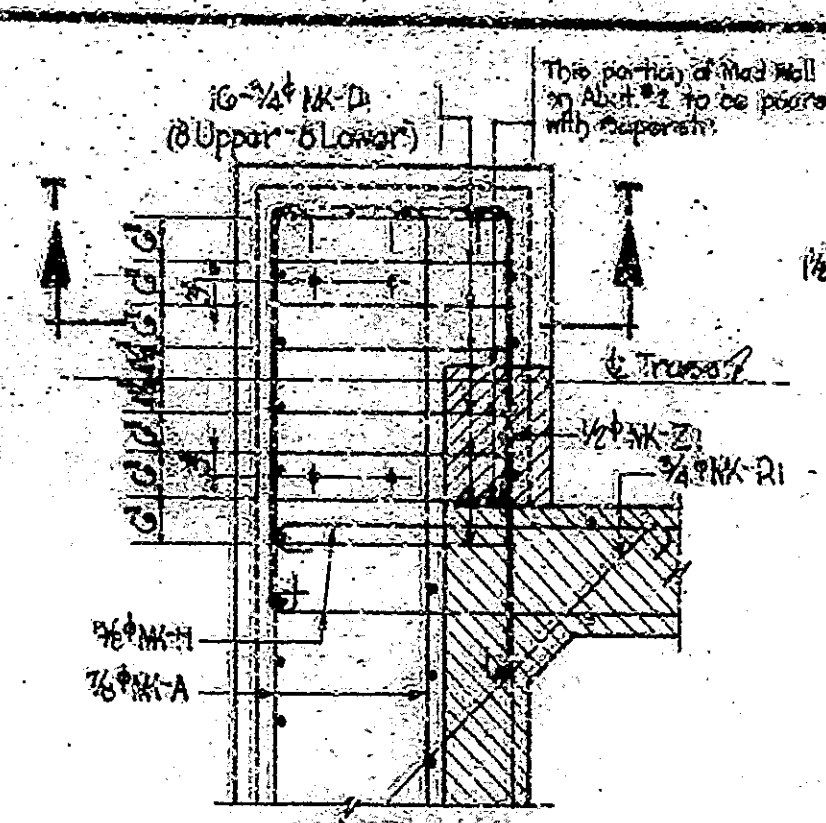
DETAILS - ADJUSTMENTS NO. 1 & NO. 2
